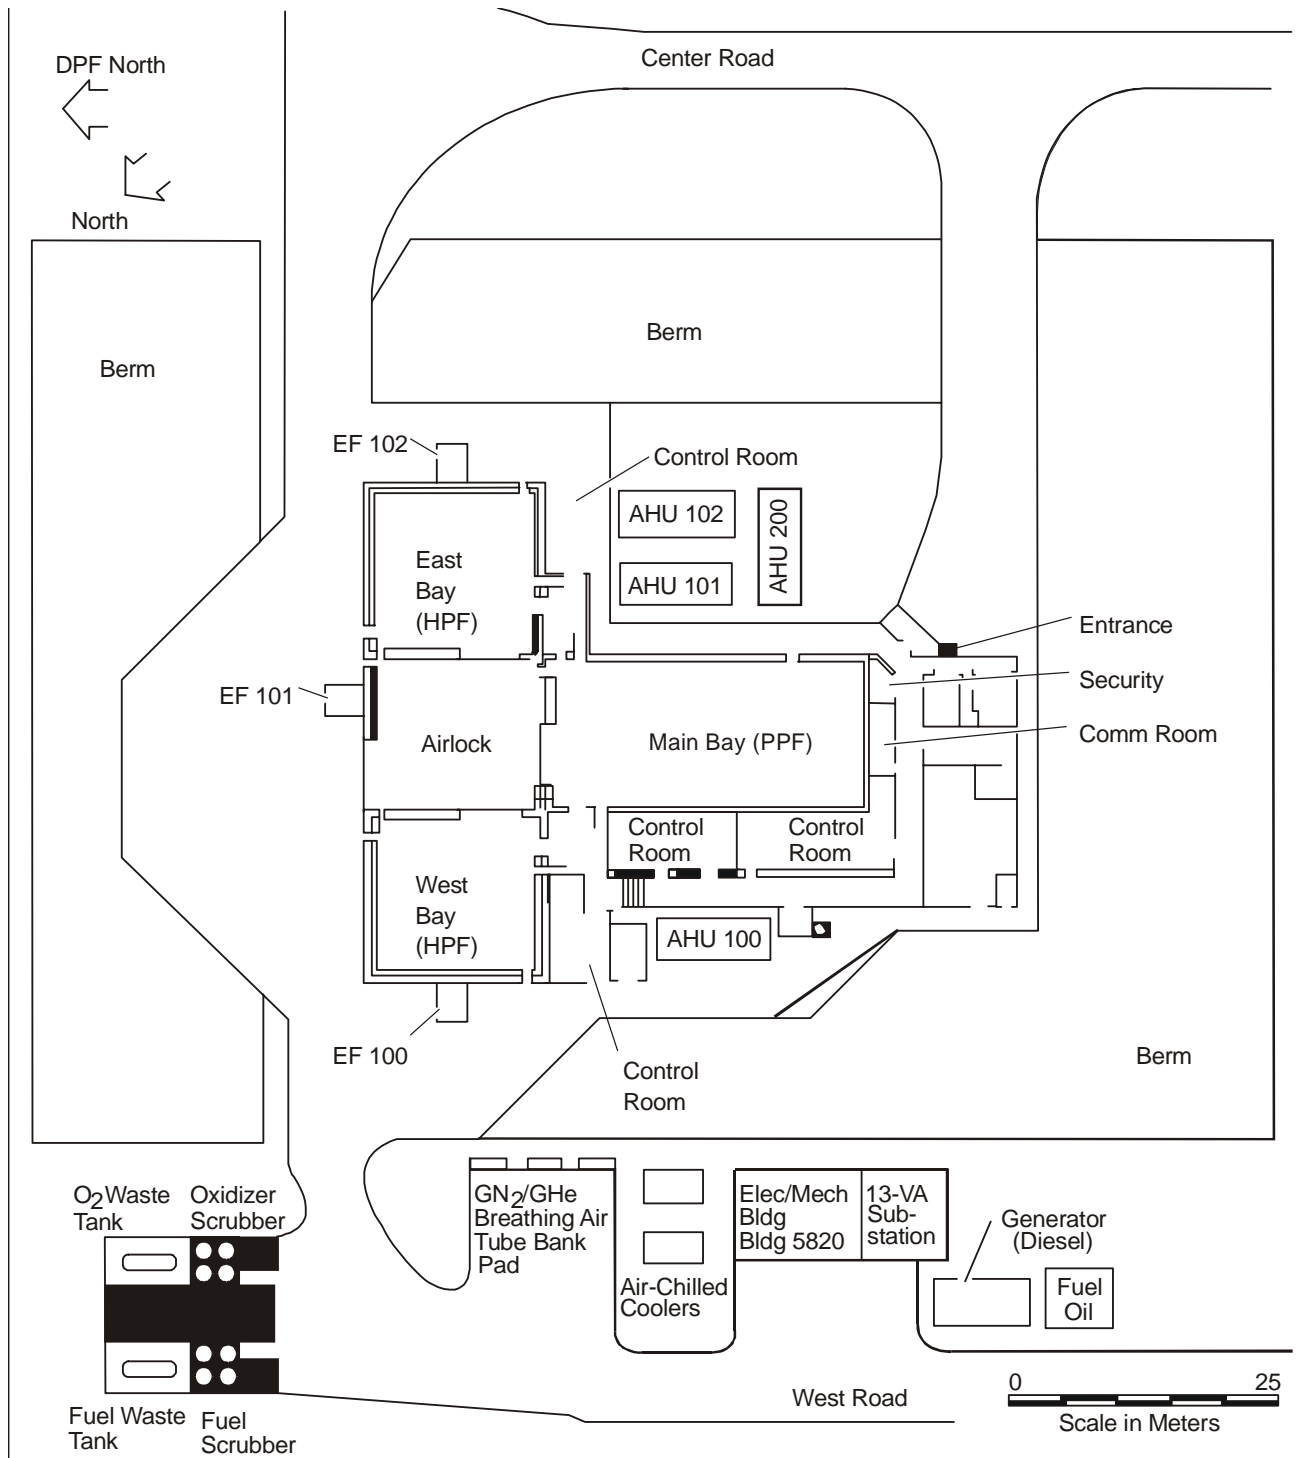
DPF Area Detail Site Plan
